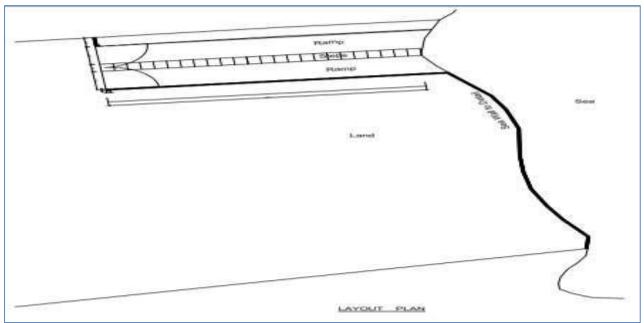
A layout plan for the construction of the eco-friendly seawall and a ramp (Source: Architectural design by Civil Base Consultants, December 2022)
